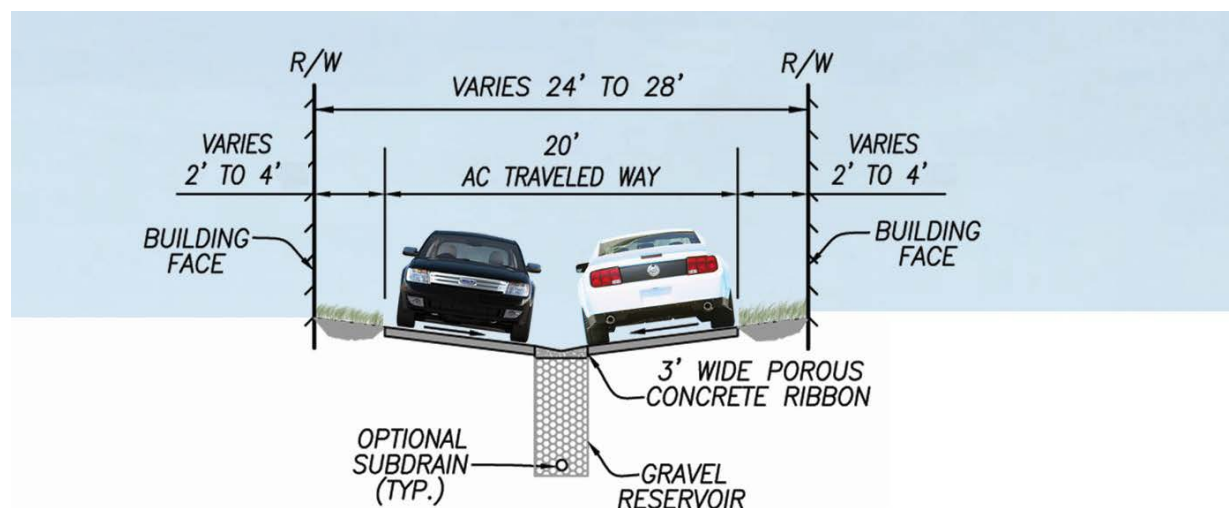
Peck Street, East of Main Street, Prospect Street and Olive Street
